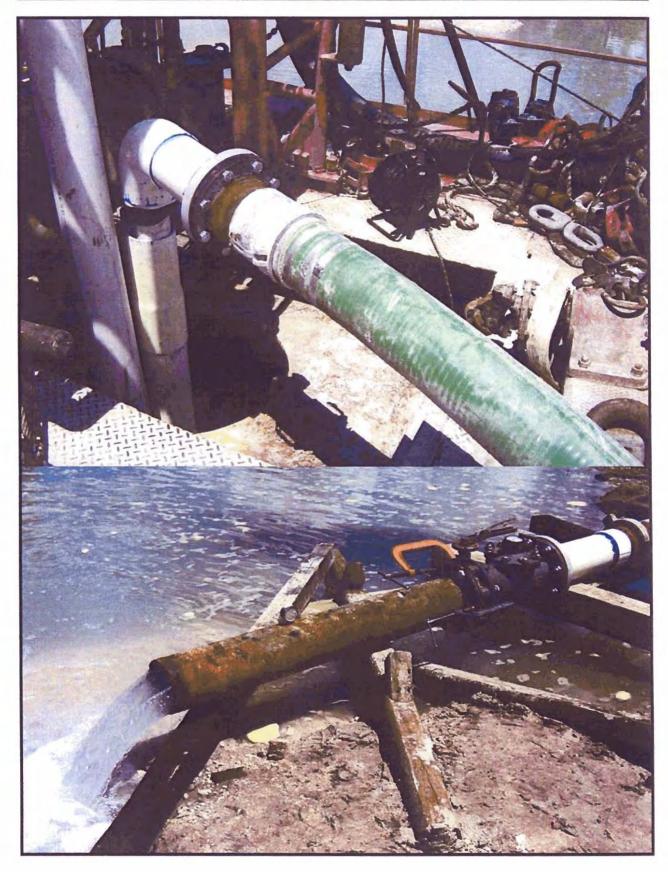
Step Testing Drop Pipe and Discharge Assembly
